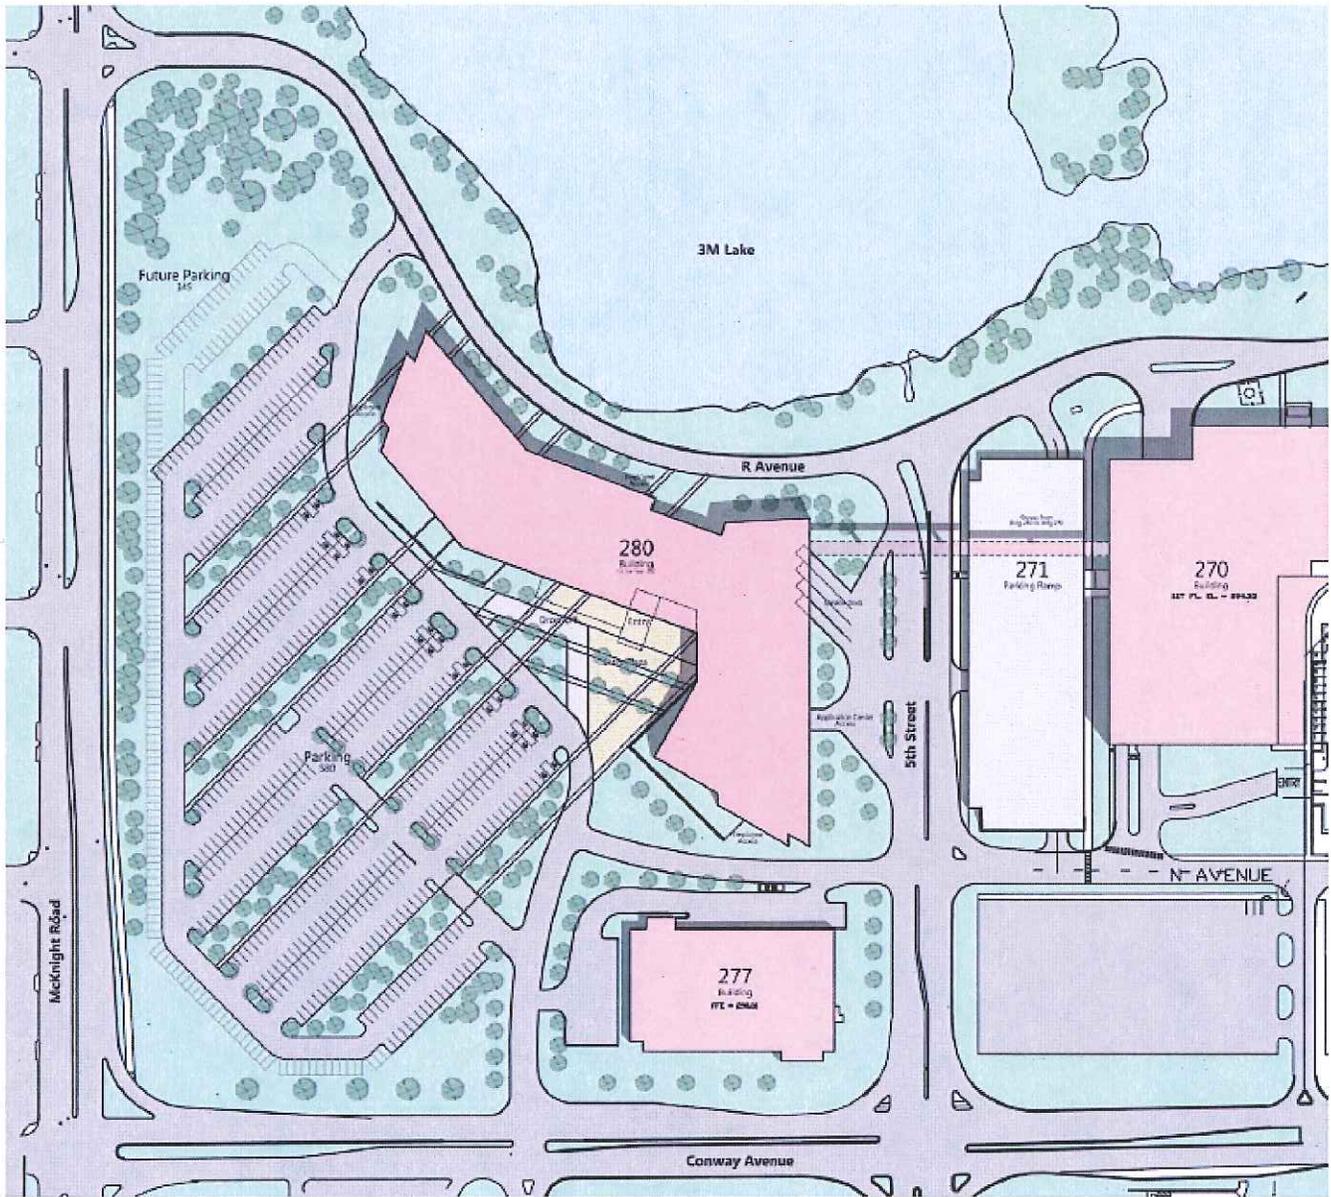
3M RESEARCH AND DEVELOPMENT BUILDING SITE PLAN
